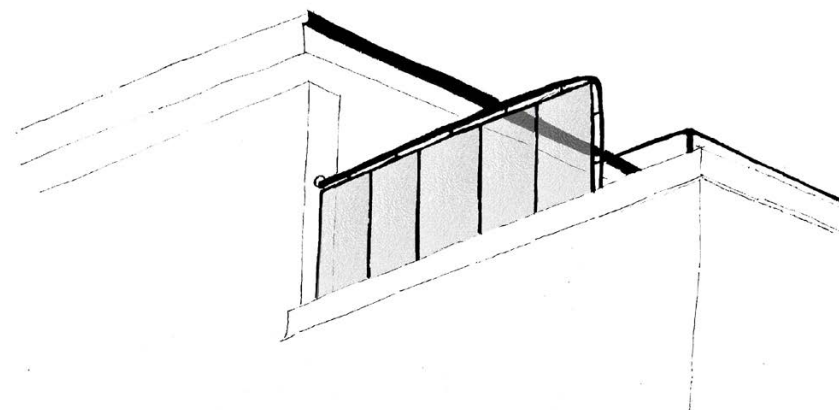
Roof terrace with balcony railings on Brödragatan with stained glass
